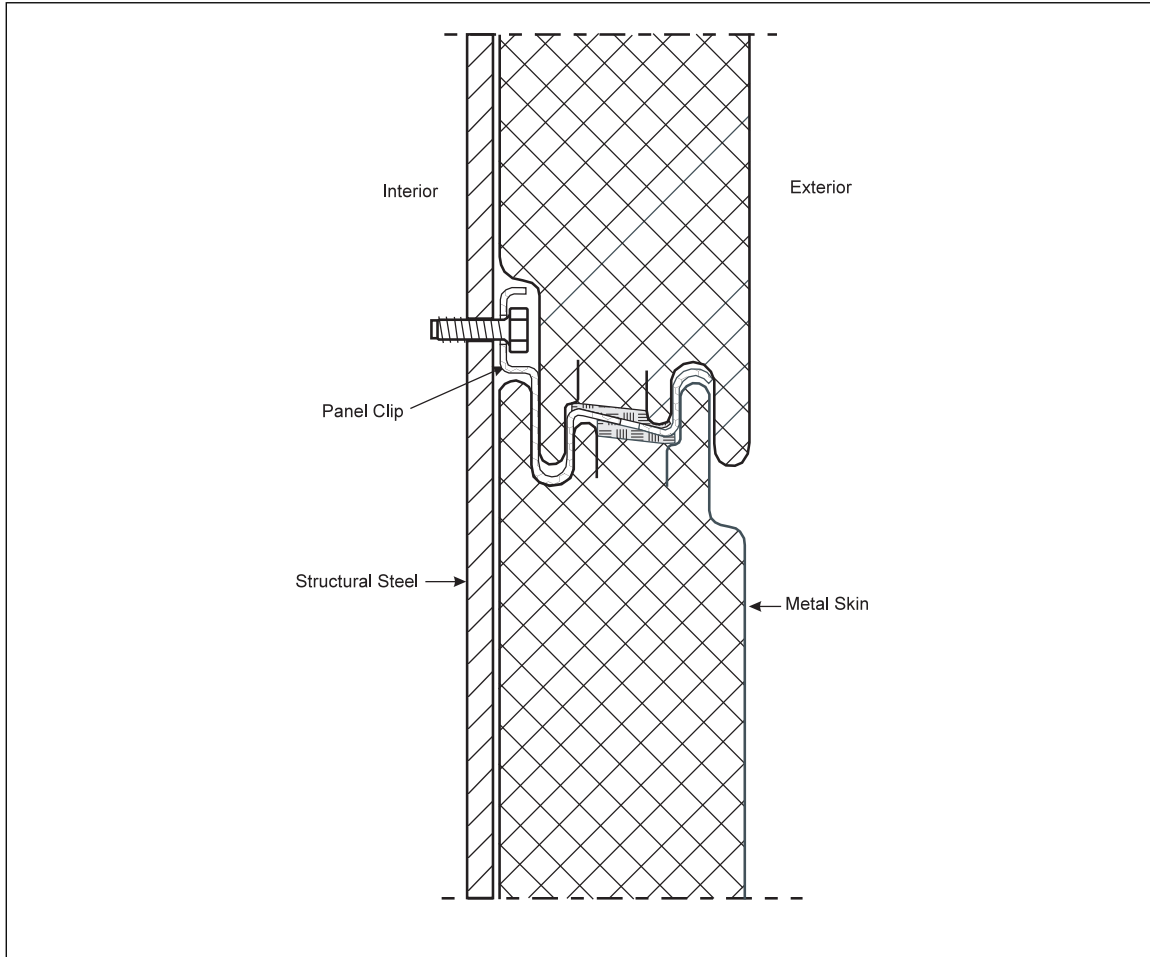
Panel clip with tongue and groove joint
